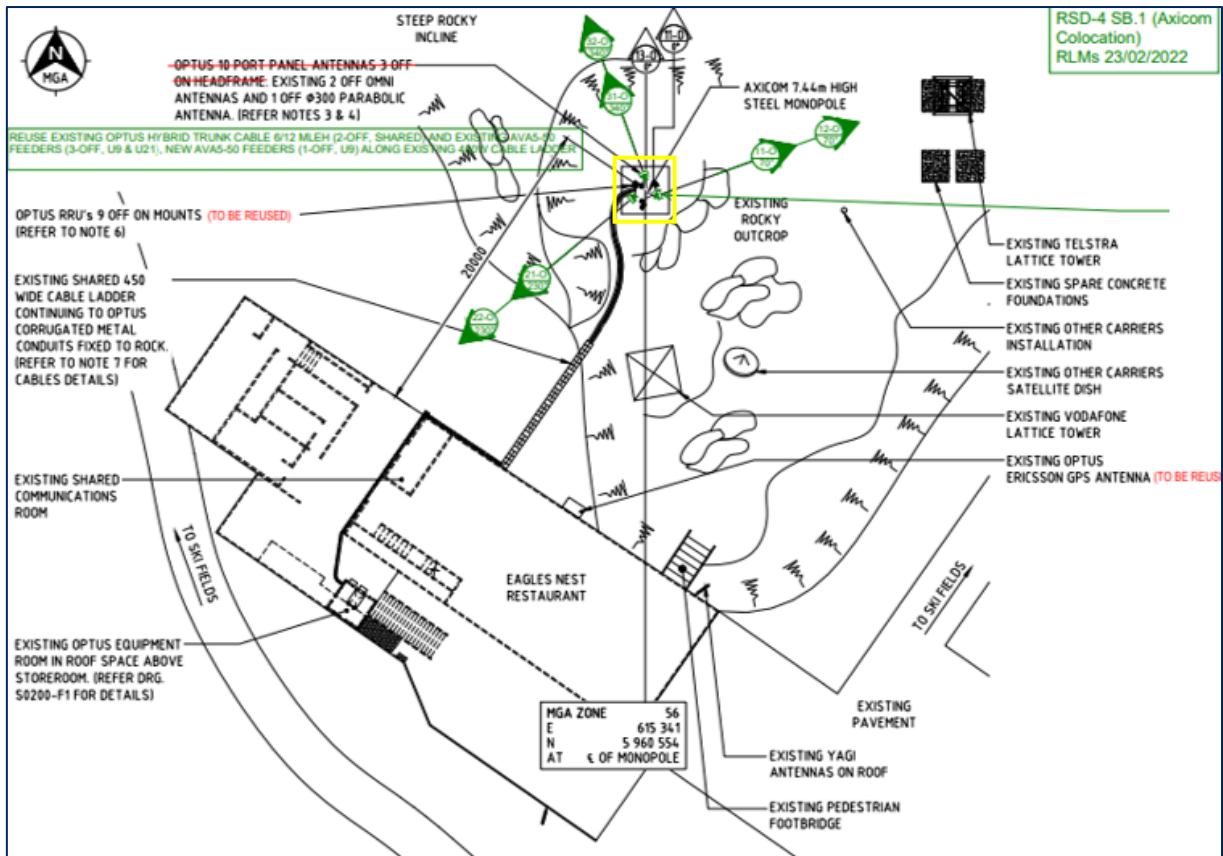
| Location of Optus tower and adjoining installations (Source: Applicant’s documentation)
